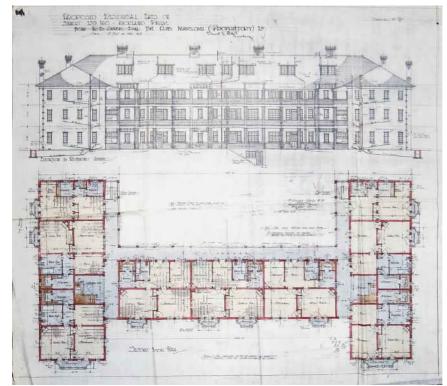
Original plan for proposed residential flats along Kingsway Avenue from 1928_ floor plan shows the originally designed three storey double wing flat block connected with a middle section facing Kingsway Avenue (Source: City Council of Johannesburg, Plans Archive)
